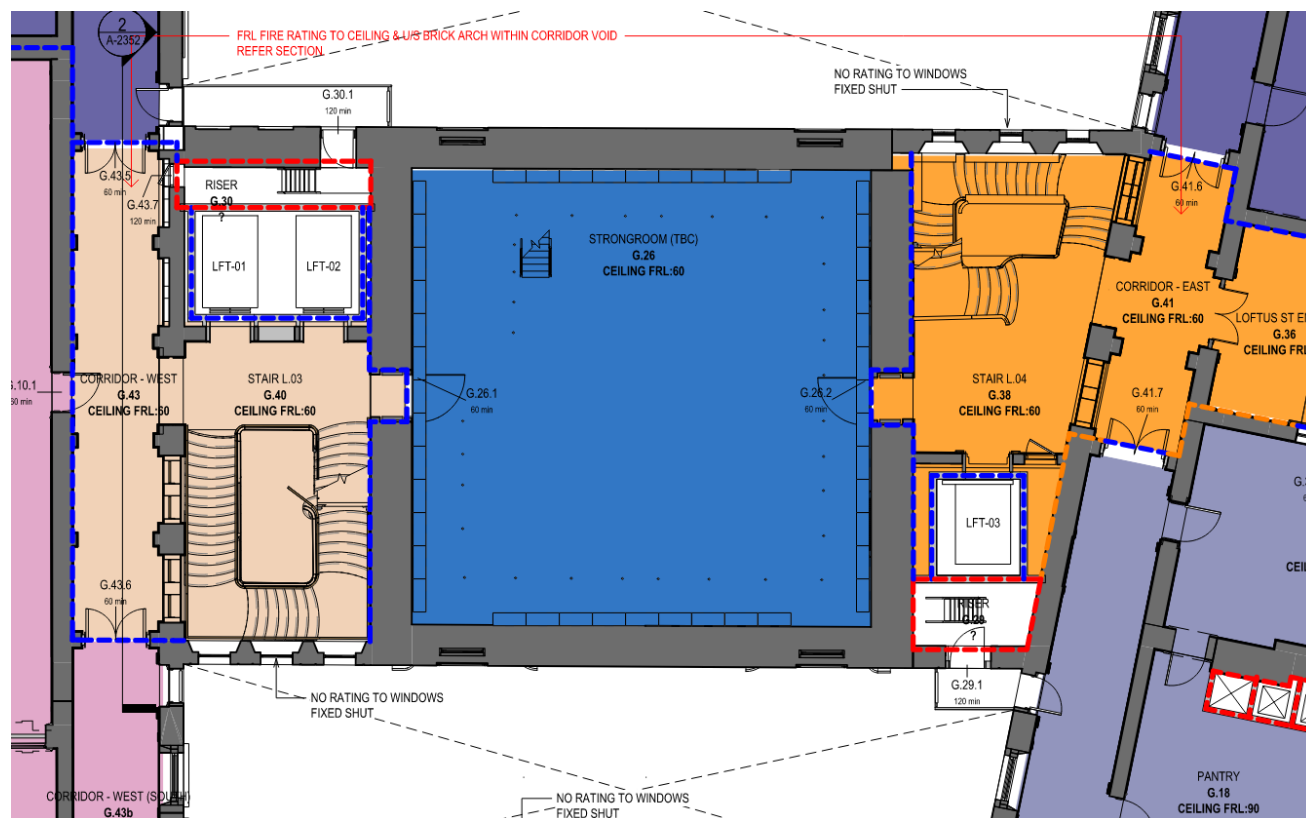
Strongroom exit doors on Ground Floor (typical on Level 1 and Level 2)
